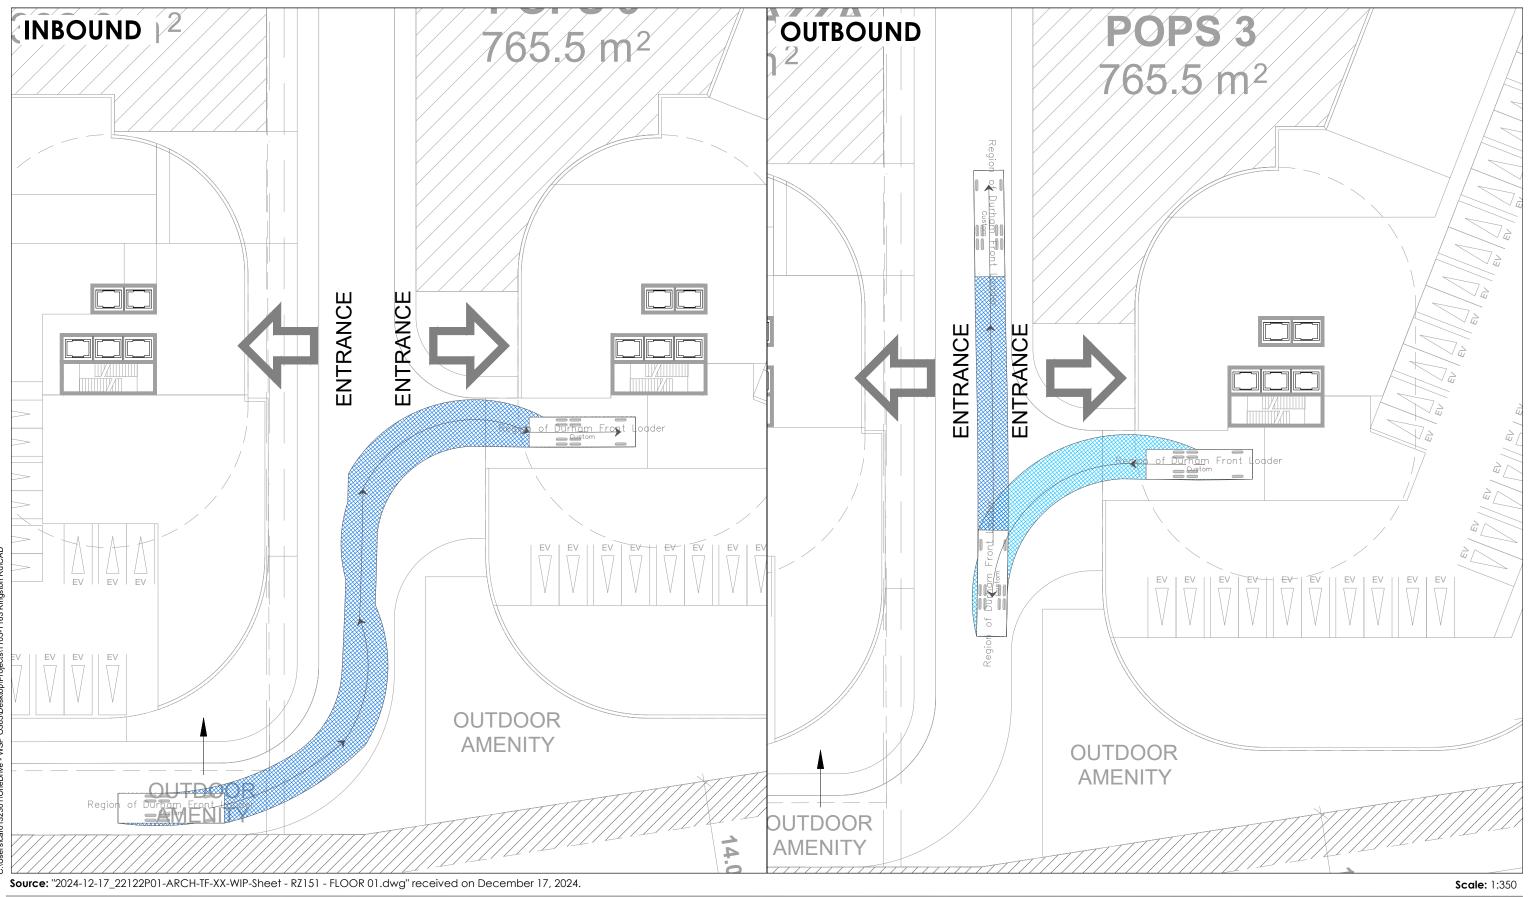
Front Loader Garbage Truck Turning Maneuver - Building C 1105-1163 Kingston Road, Pickering
